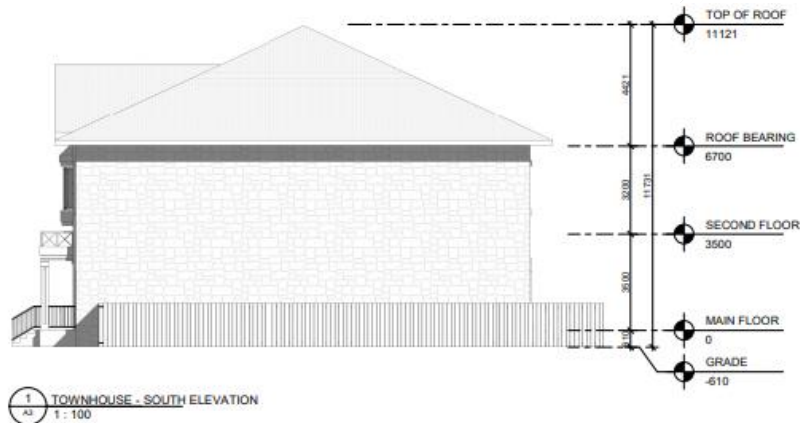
South view – Interior side yard end facing 231 Tanbark Road
